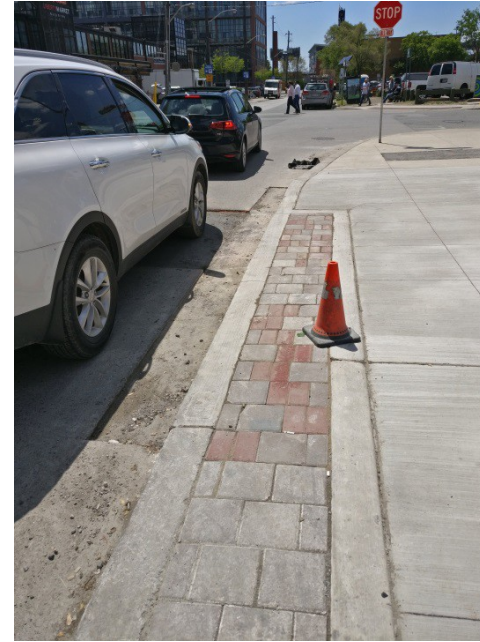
Atlantic Ave/Snooker St intersection (looking east)
